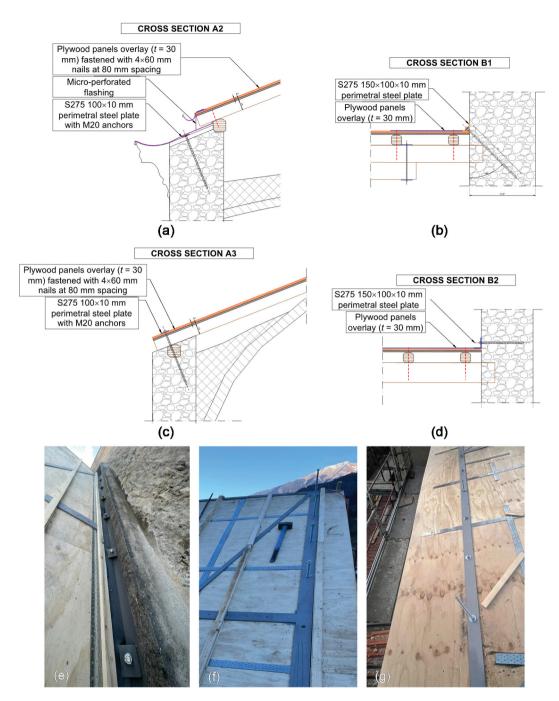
Connection between retrofitted roof diaphragm and masonry walls, with reference to the plan of figure 5: (a) cross section of connection system along the nave walls; (b) cross section of connection system in the main façade; (c) cross section of connection system along the apse walls; (d) cross section of connection system in the wall separating nave and apse; (e-g) examples of realized joints.
